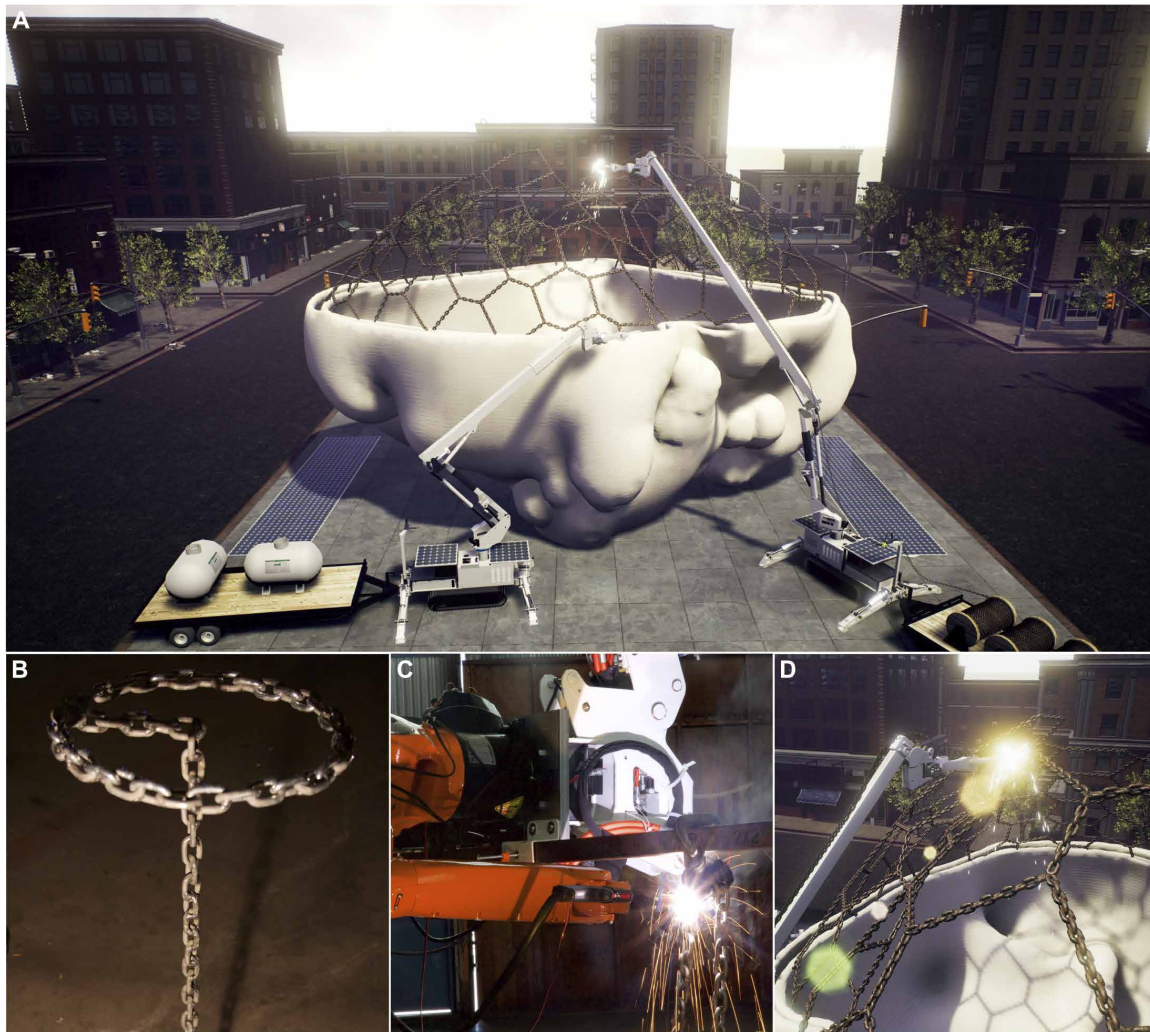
Future worksite integrations for the DCP. (A) Rendering of DCP systems fabricating architectural-scale structure in urban environment, using combined PiP and robotic chain welding fabrication. (B) Manually fabricated welded chain stool structure. (C) Automated fabrication of welded chain structures using the DCP. (D) Rendering detail, showing DCP performing welded chain fabrication.
